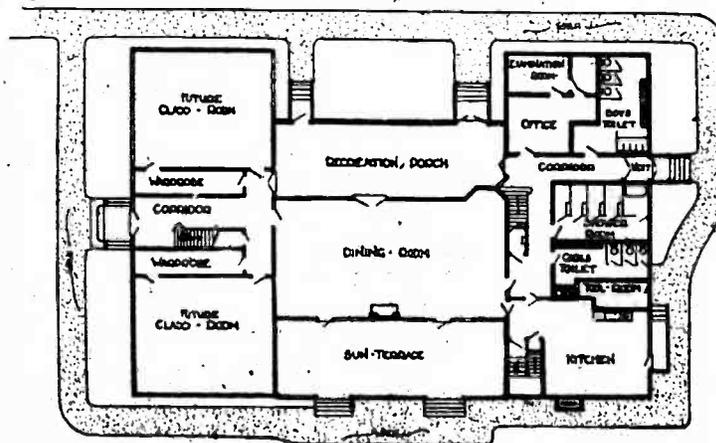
First-floor plans, Edward Mott Moore Open-air School, Rochester, N. Y.
